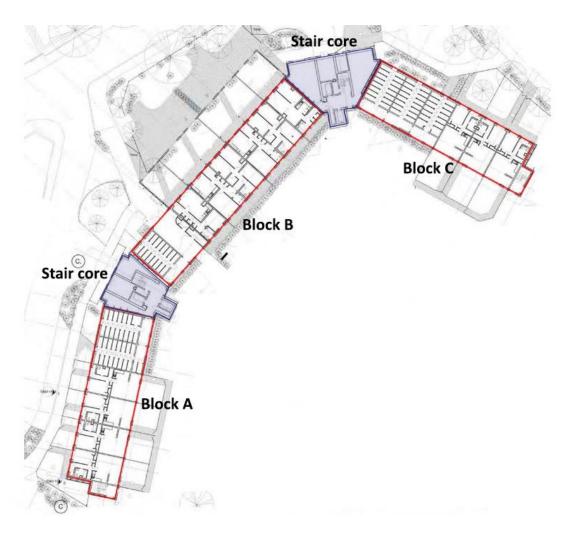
Airtight layer at the ground floor (ECD Architects, 2013).
